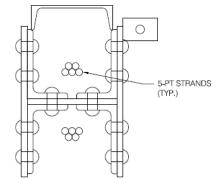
Proposed Post Tensioned Bottom Chord Section
